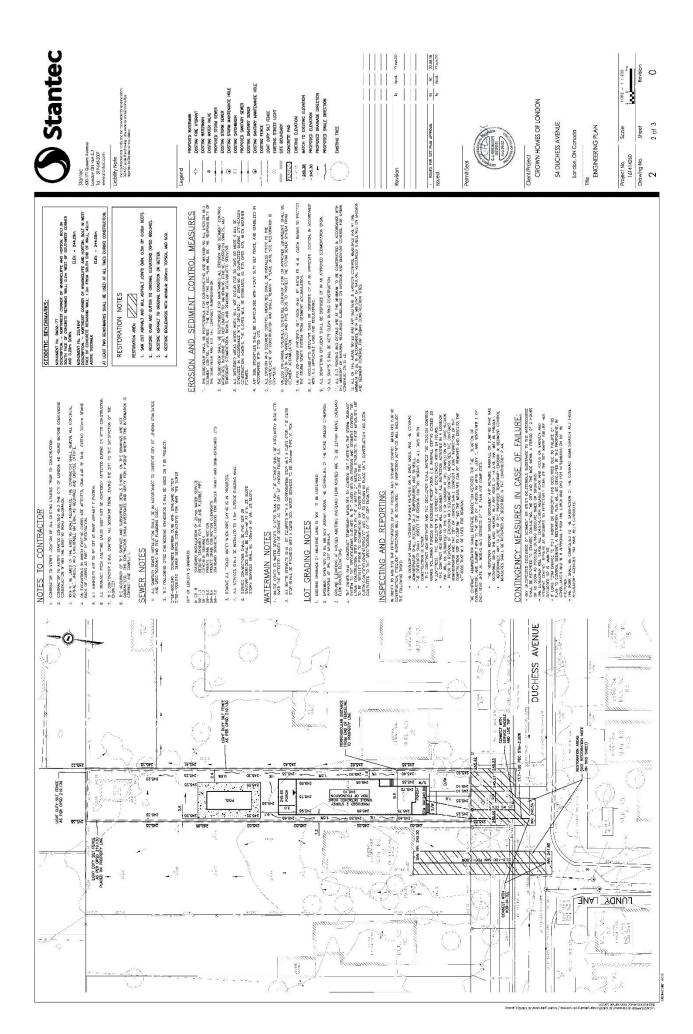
Site Plan submitted with the Heritage Alteration Permit application for 54 Duchess Avenue. The front yard parking shown in the Site Plan was approved as part of the Minor Variance application (A.109/22).
